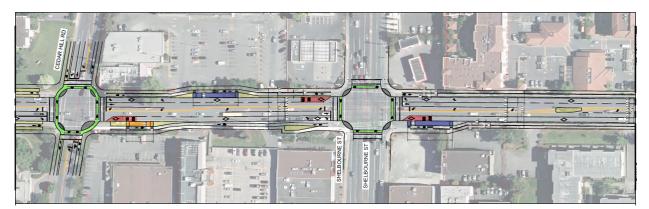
Long-Term Vision at Cedar Hill Road and Shelbourne Street
